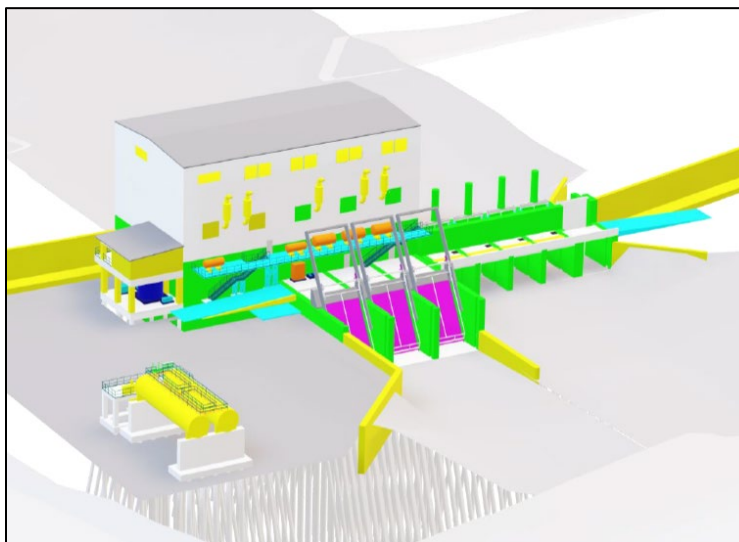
Typical Site Plan of a Pump Station with Large Pumping Capacity
